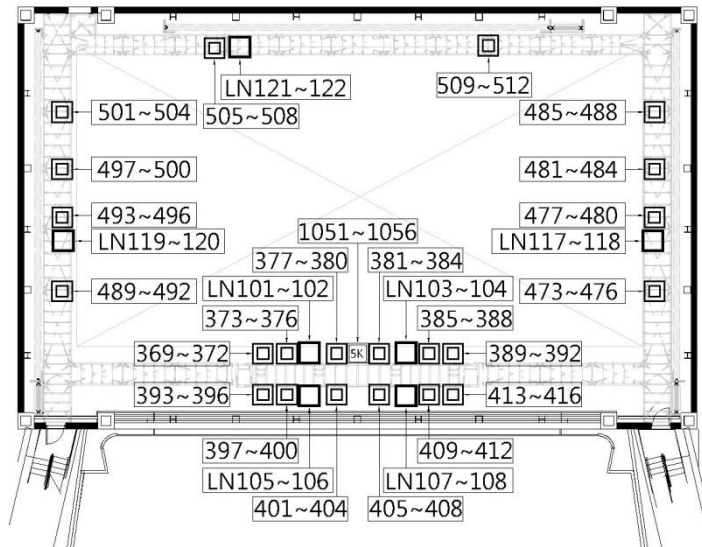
The Third Floor Gallery and Lighting Bridge Circuit Layout
